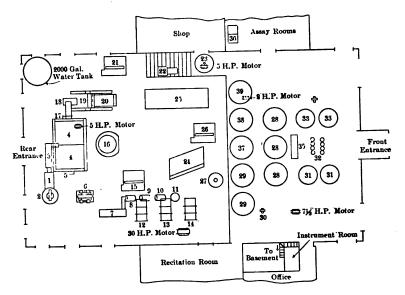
FLOOR-PLAN, ECKLEY B. COXE MINING LABORATORY.
